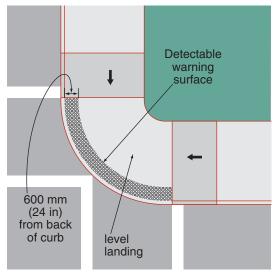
B-20. Examples of Detectable Warning Installations at Curb Ramps
